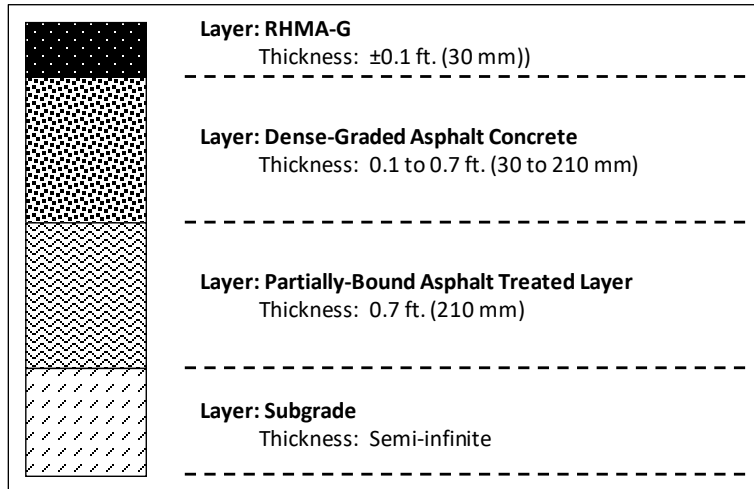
GLE-162: Assumed pavement structure from limited coring and DCP testing.
